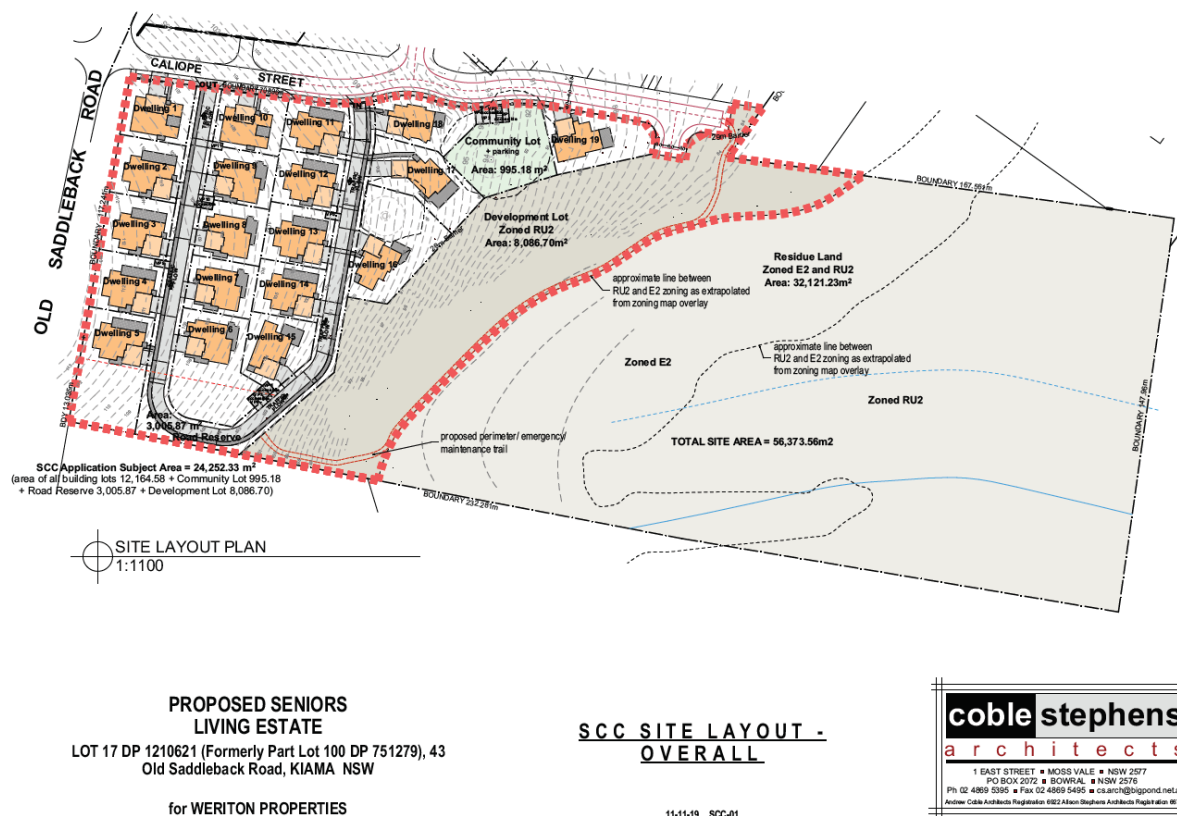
Excerpt overall site layout plan (Coble Stephens Architects 2019)
